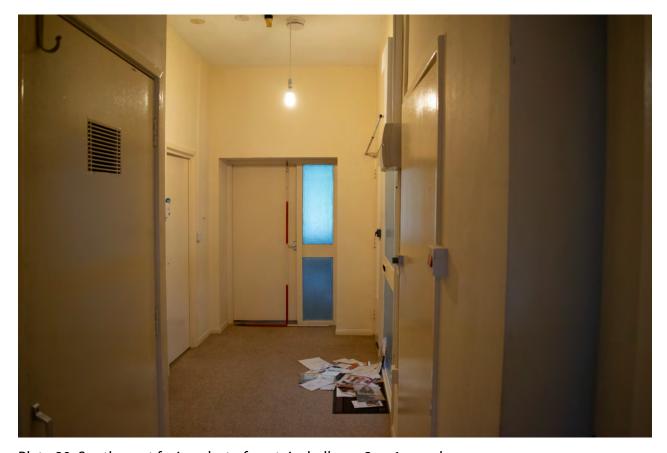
South-west facing shot of upstairs hallway. 2mx1m scale.
